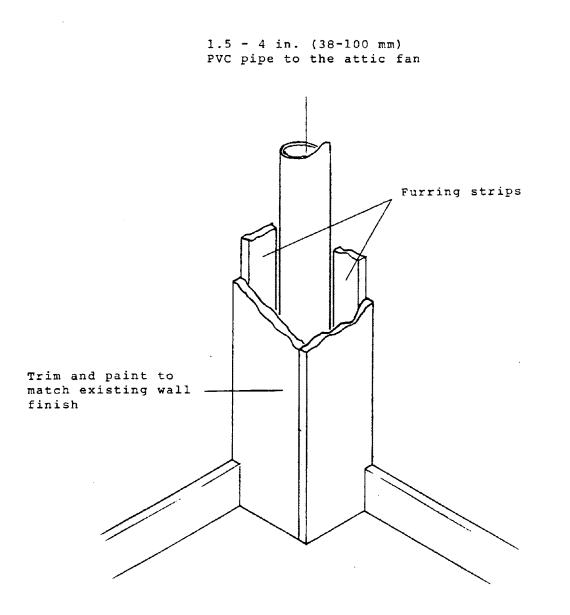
Illustration of "boxing in" the suction pipe in a corner of a room where no closet corners are close enough to extend the pressure field.
